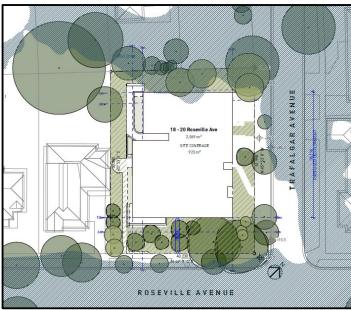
Site Arrangement Plan (Source: Smith & Tzannes)
